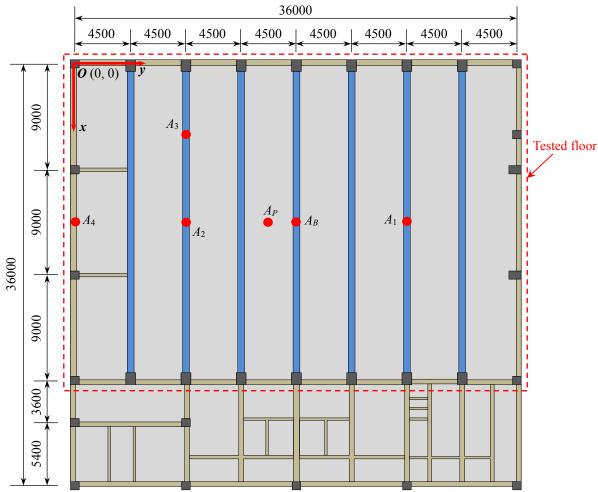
Outline of prestressed concrete floor #1 (all dimensions in mm)
